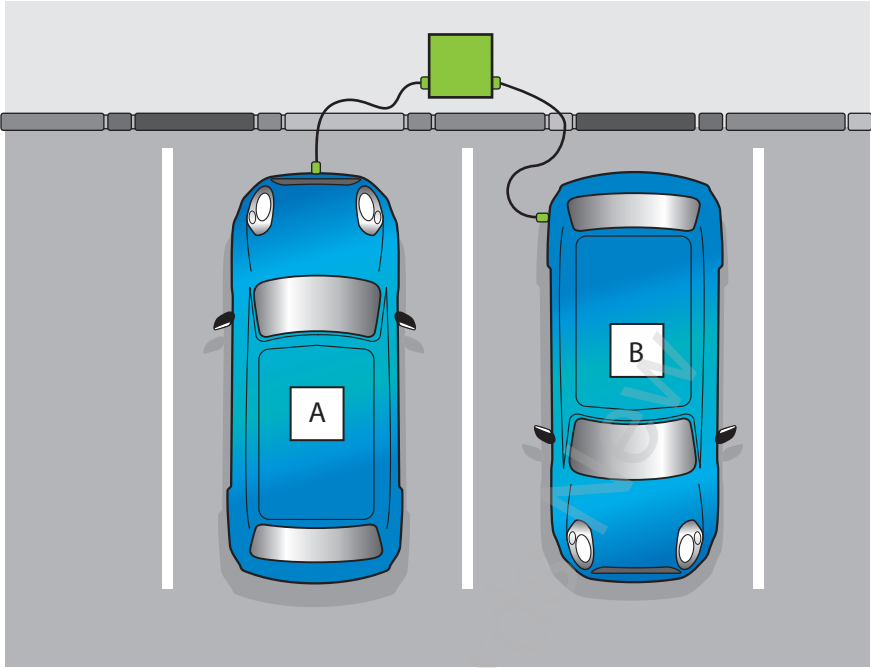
Positioning EVSE in apartment parking or other multi-car dwelling
